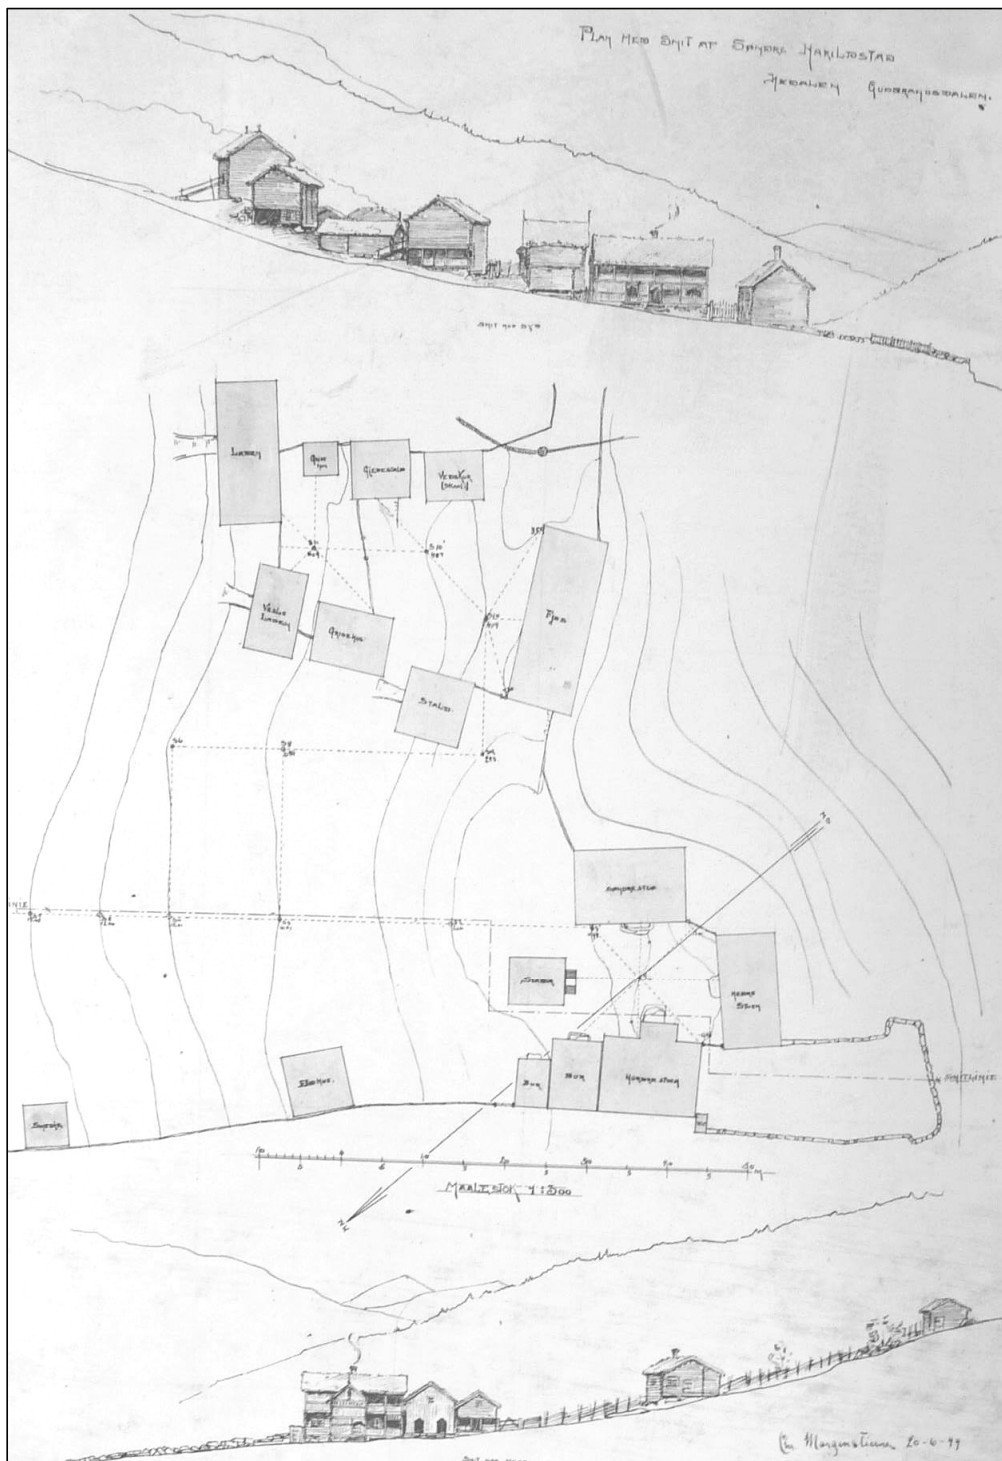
'Plan med snit, Søndre Harildstad, Heddal, Gudbrandsdalen. Chr. Morgenstjerne 20-6-99'. Plan and section, Søndre Harildstad. (Riksantikvaren's archive)
